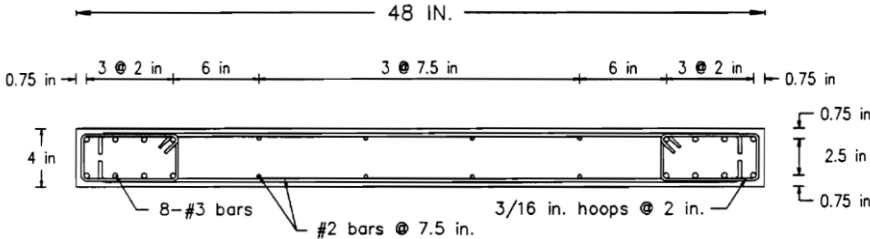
Cross-section and reinforcement detailing of RW2 (1 in = 25.4 mm). Source: Thomson and Wallace (1995).
